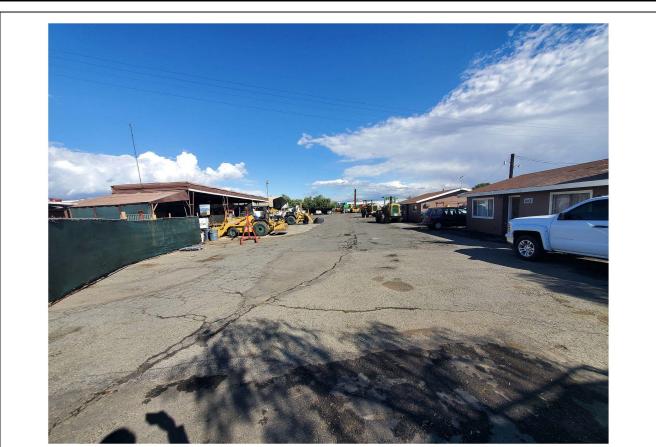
Concrete asphalt pavement surrounding the residences, facing east.
